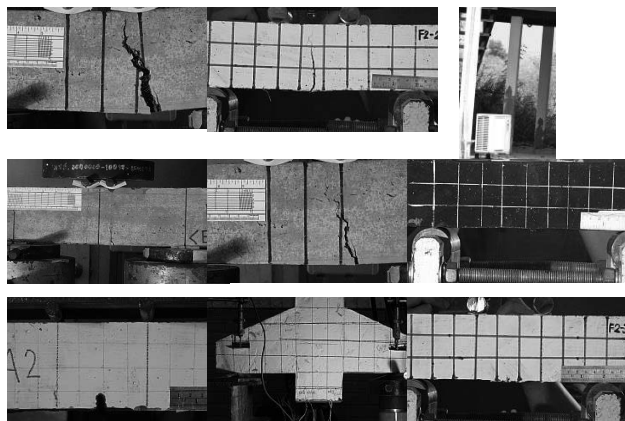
Variety of beam and building cracks that we have collected as test cases and processed. For the beams cracked in the laboratory, advanced cracks are shown: in the early stages they are not visible until they are a few pixels wide.
